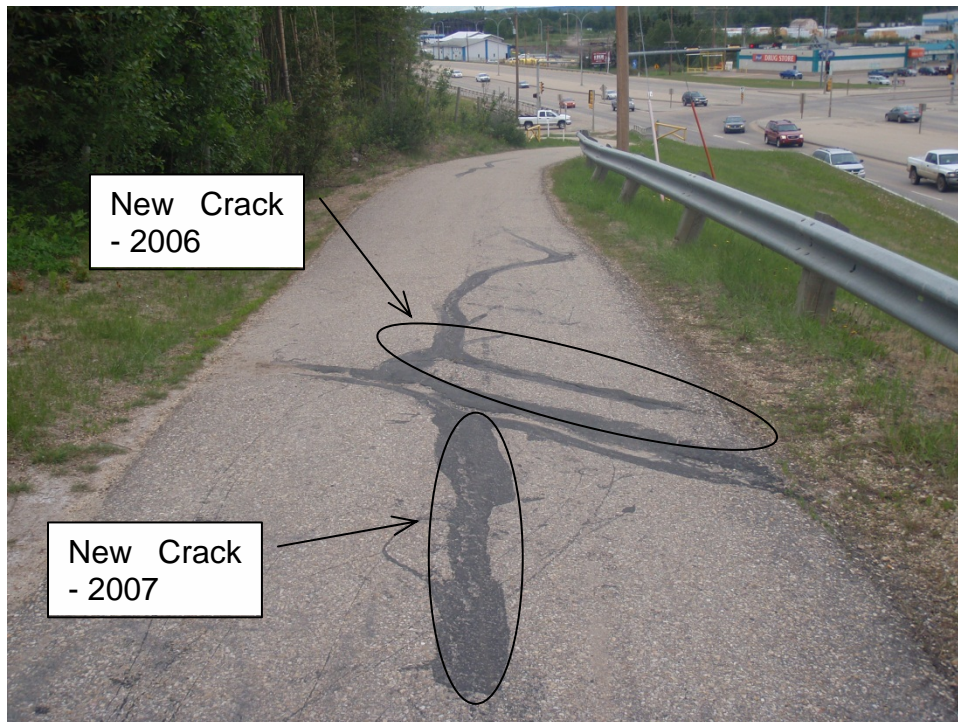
Closer view of new crack to between existing cracks (June 15, 2010).
